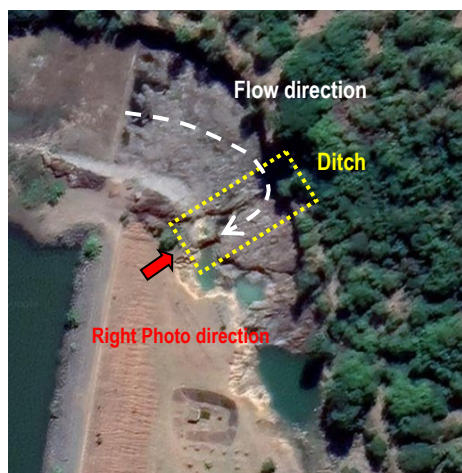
Suspected Reason of Collapses on the Right Bank Side (Embankment Side) Wall
